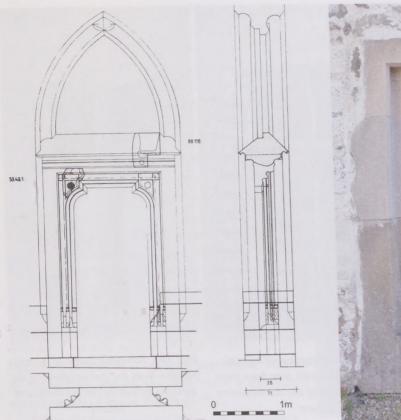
Reconstruction of the cloister walk's southern door in the northeastern palace
